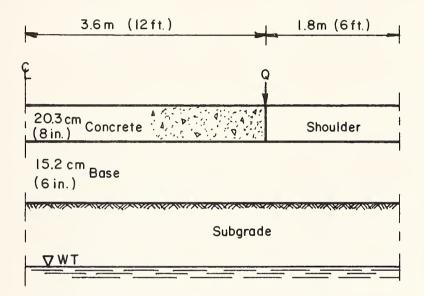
Pavement Section Without a Subdrain Pipe used in Drainage Model Study.
